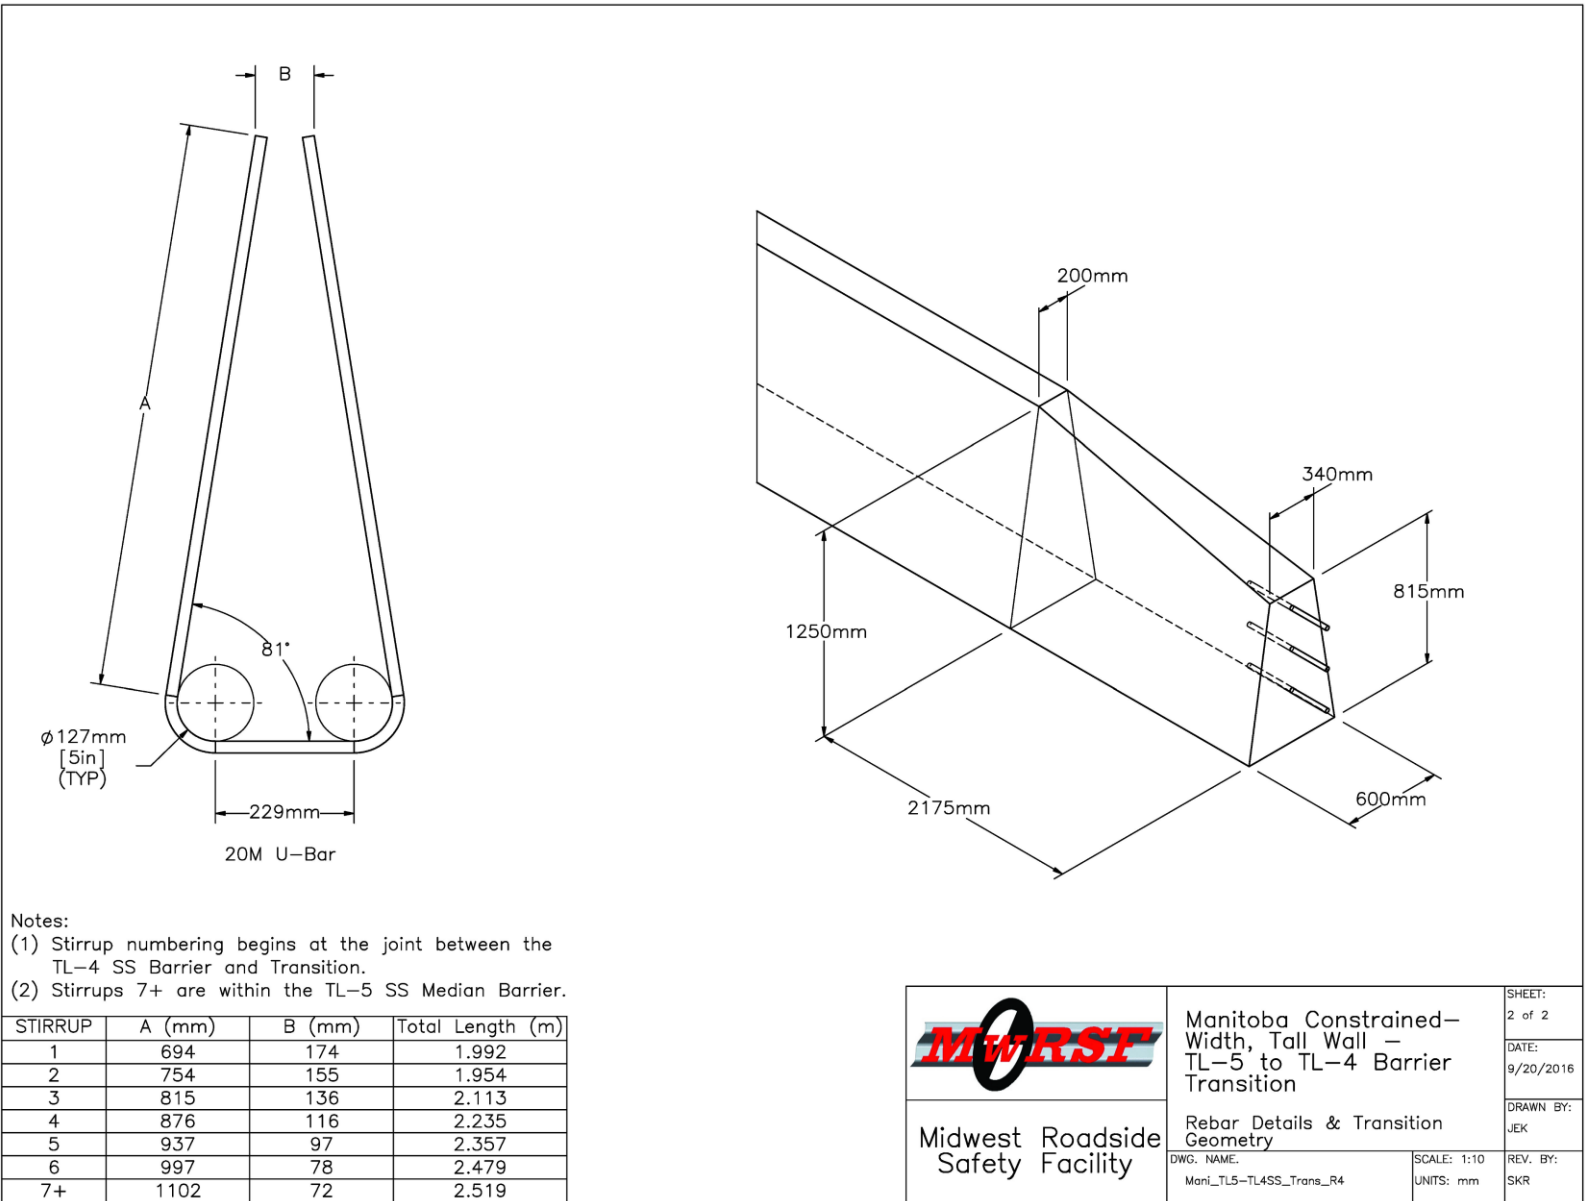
Transition Details, TL-5 Median Barrier to TL-4 Single Slope Barrier
